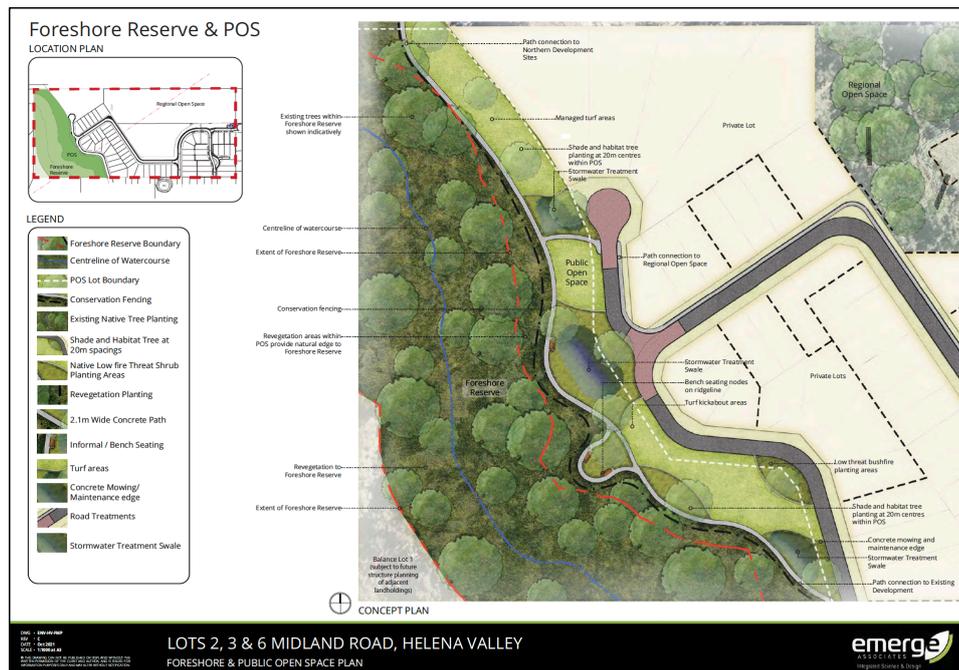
Landscape Concept Plan of Kadina Brook Foreshore and adjacent POS – refer to Appendix 3 for enlarged version. (Source: Emerge, 2024)
